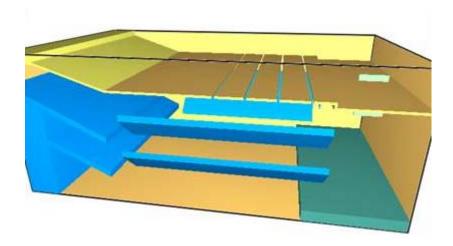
Showing model of ceiling plenum with perimeter voids created in the existing ceiling
